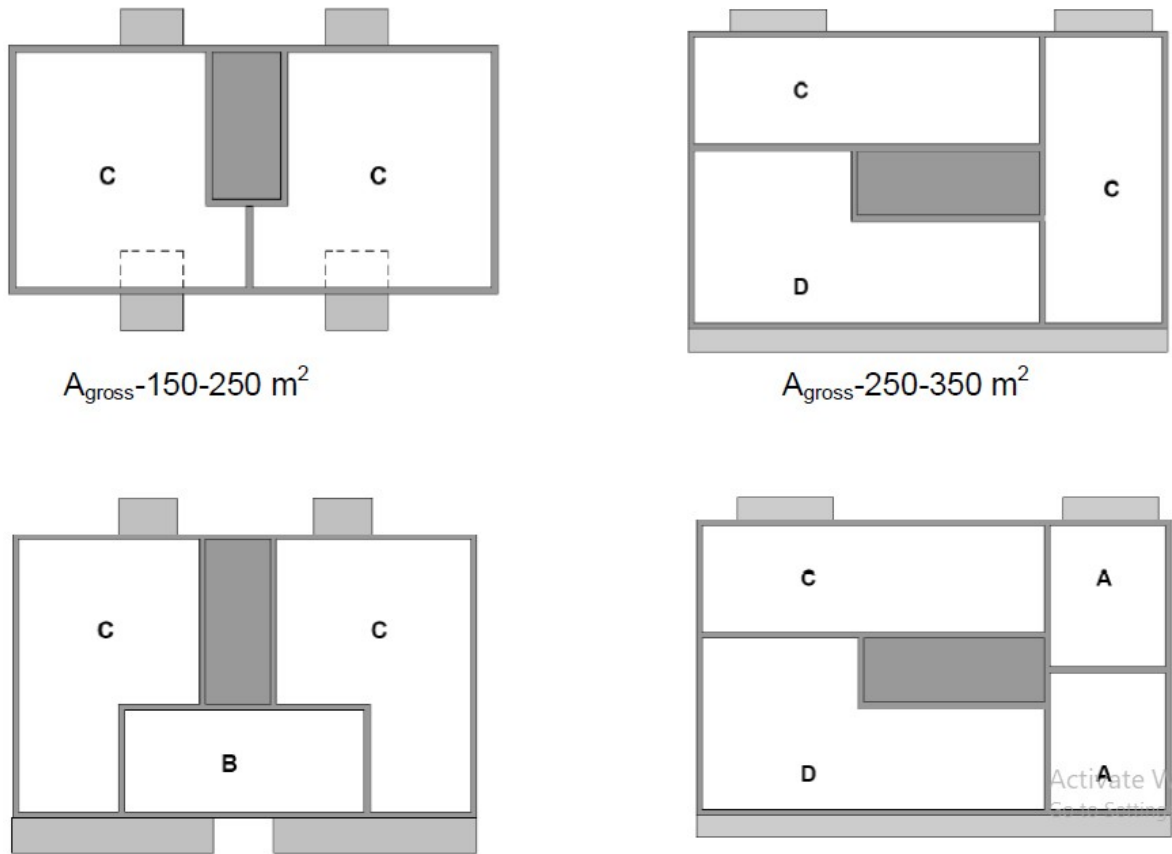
Load bearing masonry structure - typical layouts of residential units
